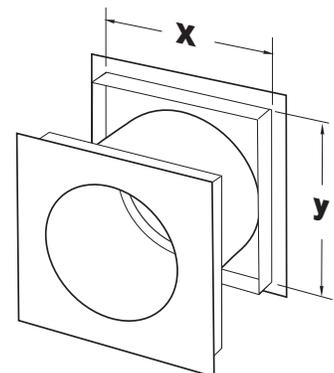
Wall cut-out specifications for direct vent wall thimbles may vary by manufacturer.
